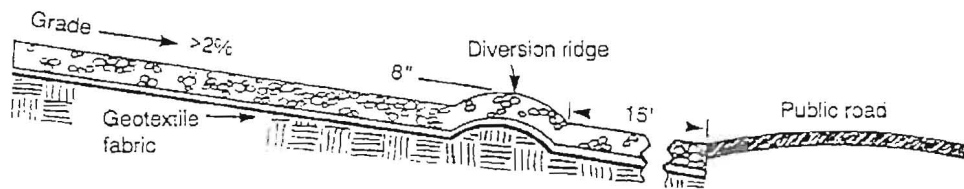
Cross-section of a Construction Entrance/Exit (NC, 1993)
